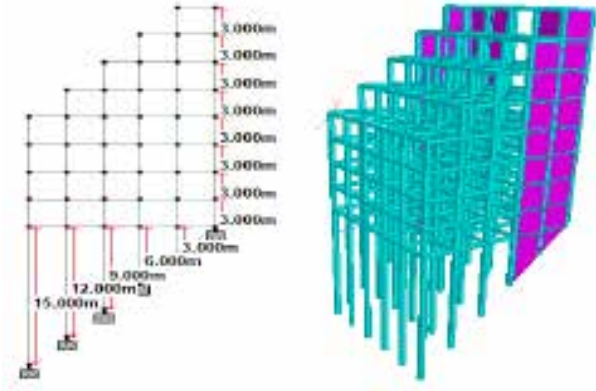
Elevation of L Shape Shear Wall with 45° Slope
